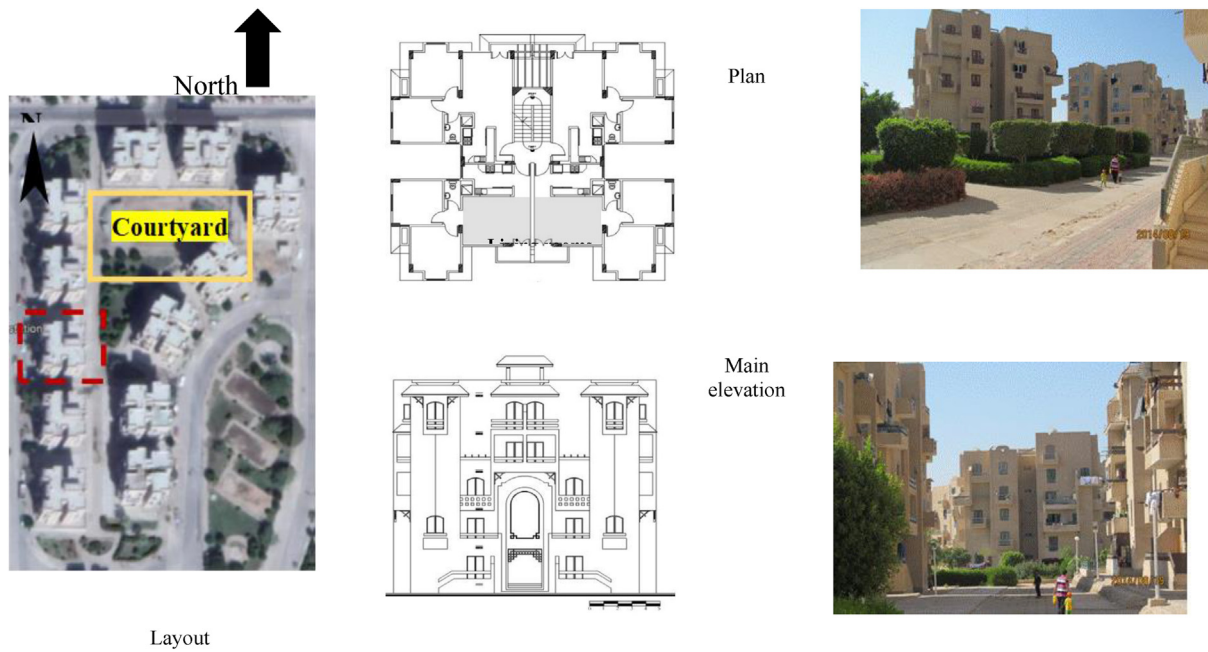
The overview of the Youth housing sector (Layout, plan, elevation, and outside view).
